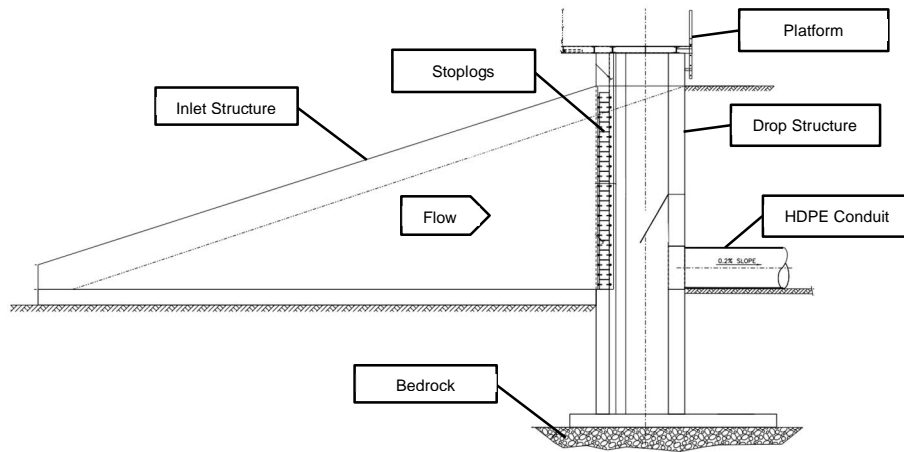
Elevation View Showing a Concept of The Proposed Inlet and Drop Structures
